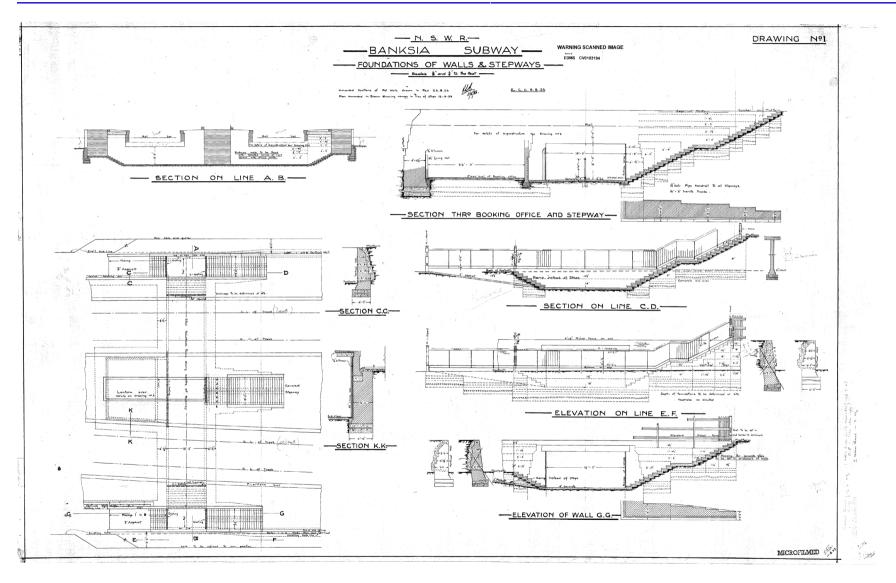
N.S.W.R Banksia Station foundations of walls and stepways, c. 1923 (Source: Sydney Trains plan room)
